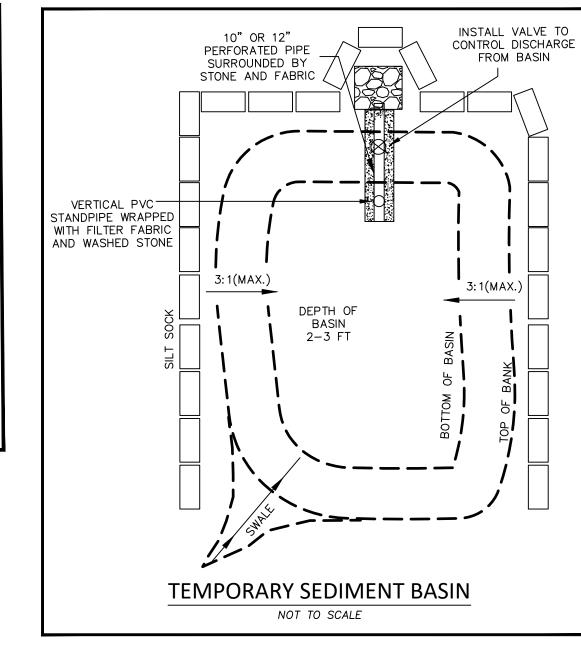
OF 3) DETAIL SHEET (3 OF 3)
